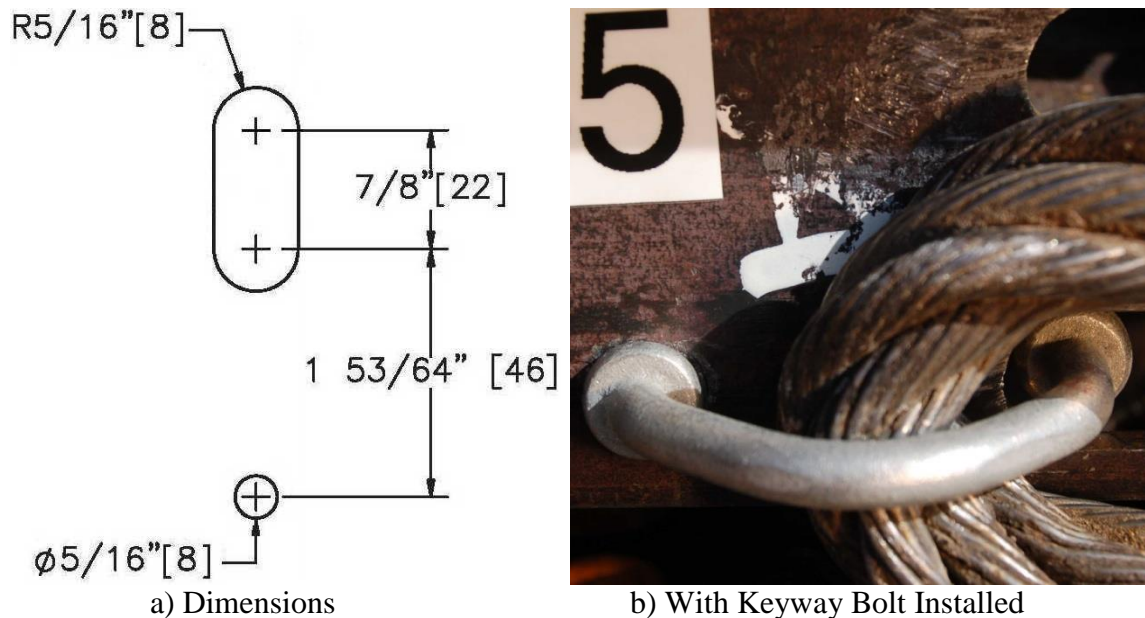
Large Oversized Keyway—(a) Dimensions and (b) With Keyway Bolt Installed
